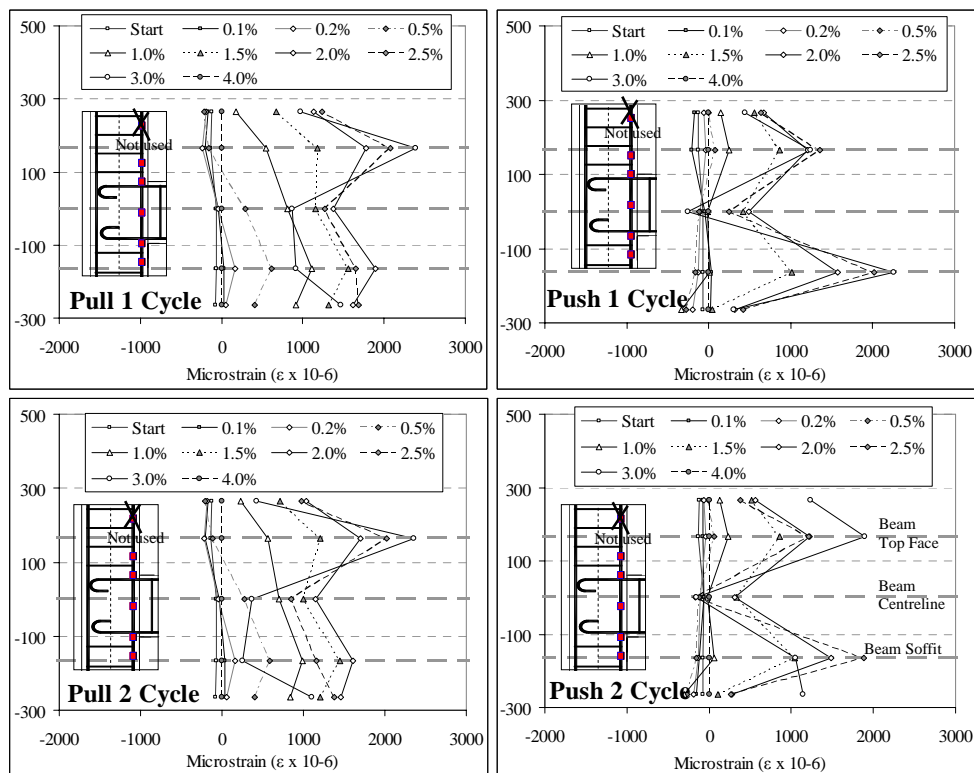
Column interior face longitudinal reinforcement strain profiles for the specimen NS-O1.
